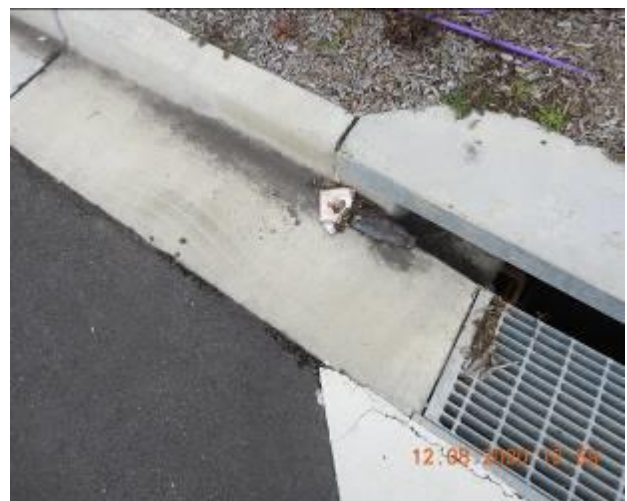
Crack propagation and loss of material through kerb and gutter
